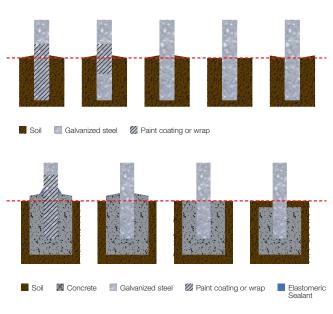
Showing the best design (left) to worst design (right) for galvanized steel embedded in soil and concrete. See also Figure 11 for more details on the best design practice for posts embedded in concrete in a corrosive location.
